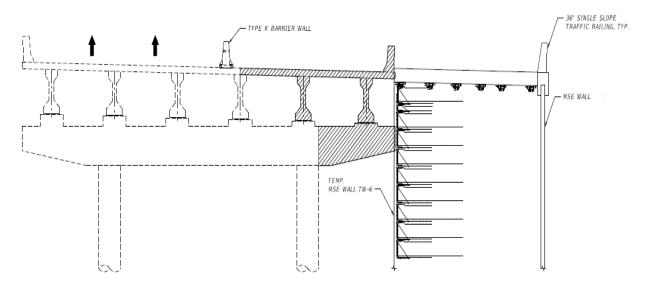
Ramp Bridge Replacement with MSE Walls
